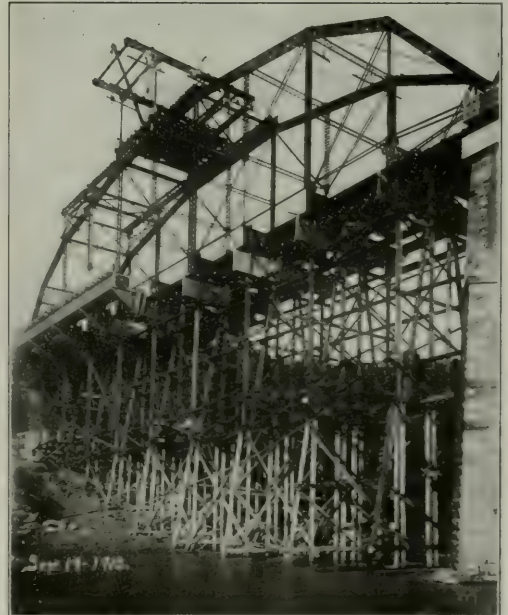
False Work Under Span 5 Showing Connection of New Floor Beams to Old Ones and the Brackets Supporting Material Track.
